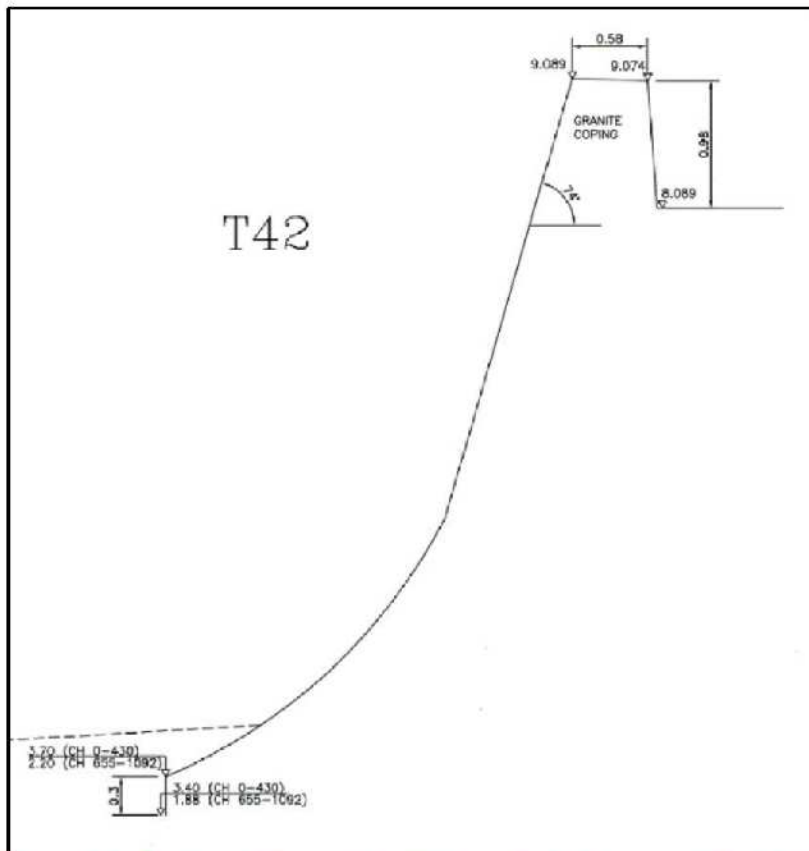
Section-1 (Battered Sea Walls) – Typical Structural Details (not to scale).
